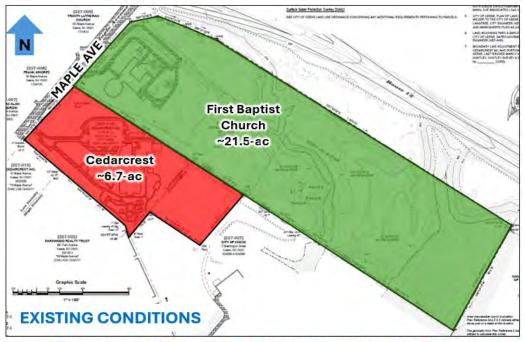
A snippet from the existing conditions plan showing the current layout of the Cedarcrest site at 91 Maple Ave & the First Baptist Church at 105 Maple Ave.
